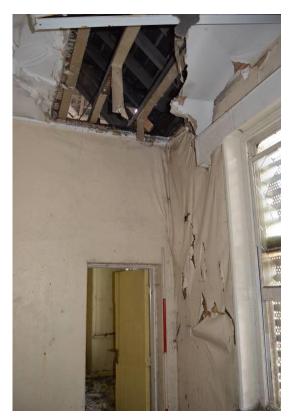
Plasterwork and later connecting door from asst. surgeon's bedroom. Scale 2m. Facing south west.
